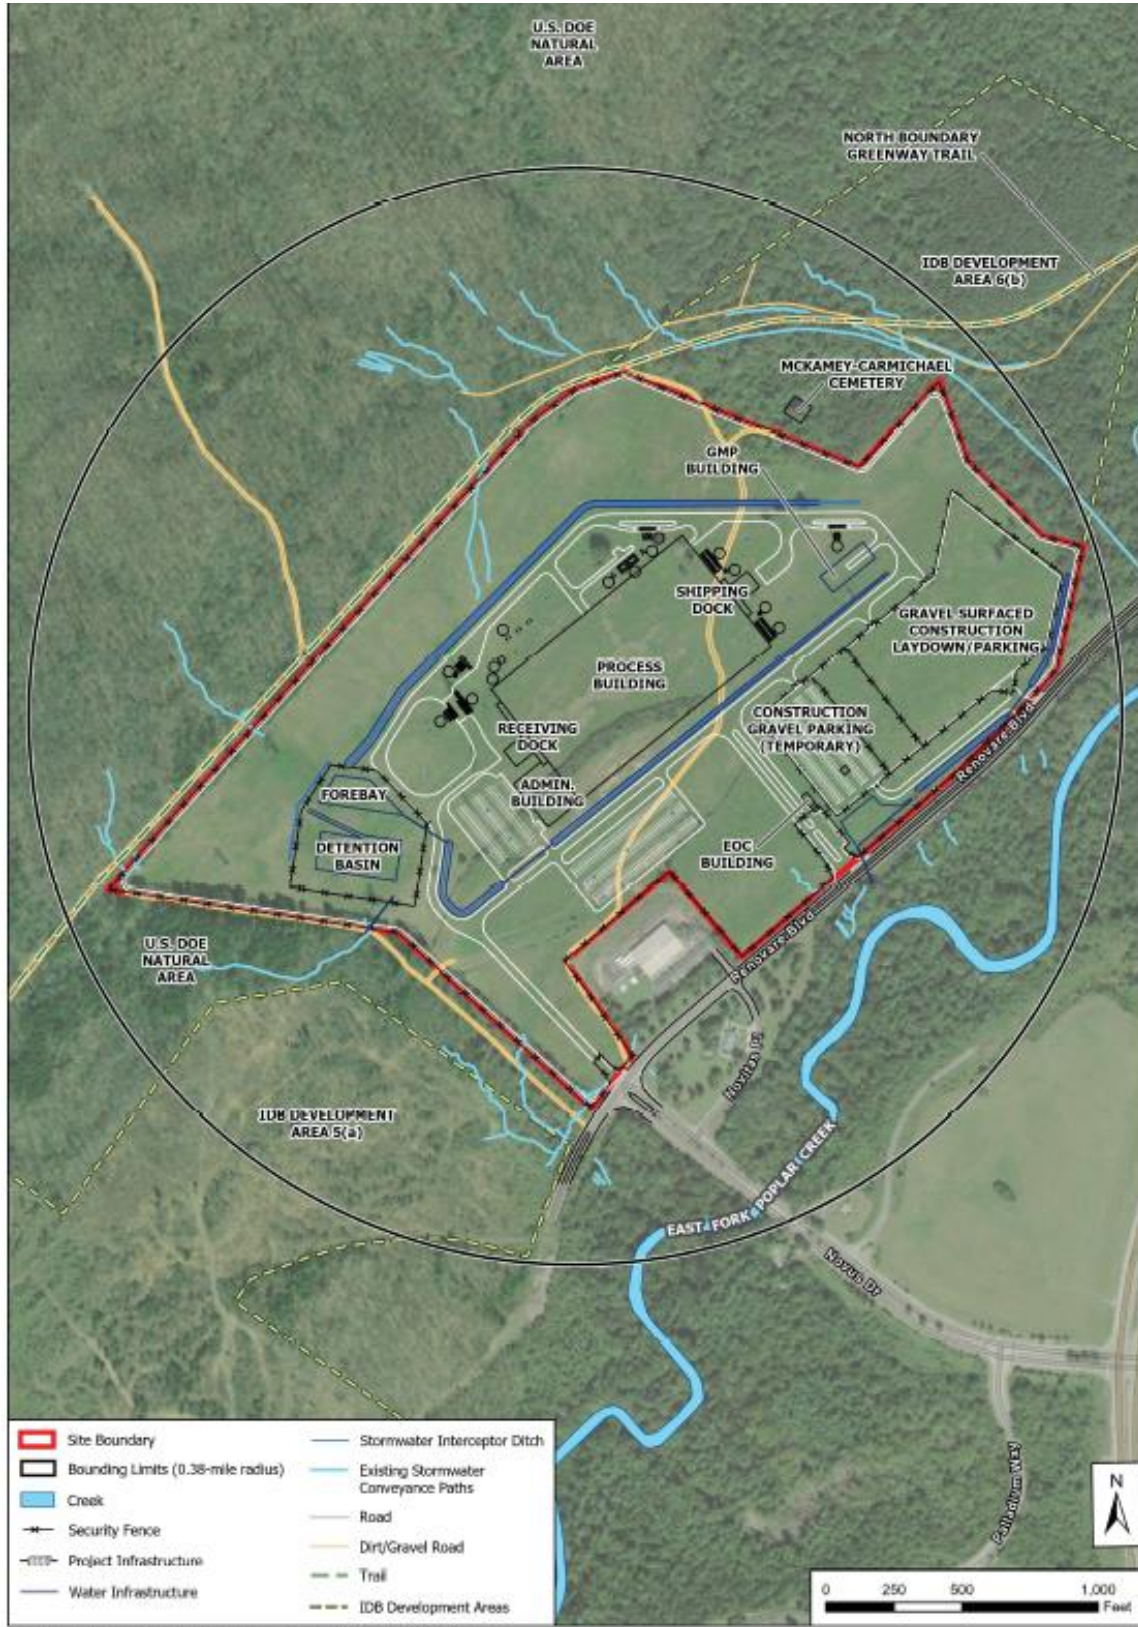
TRISO-X Fuel Fabrication Facility Site Layout
